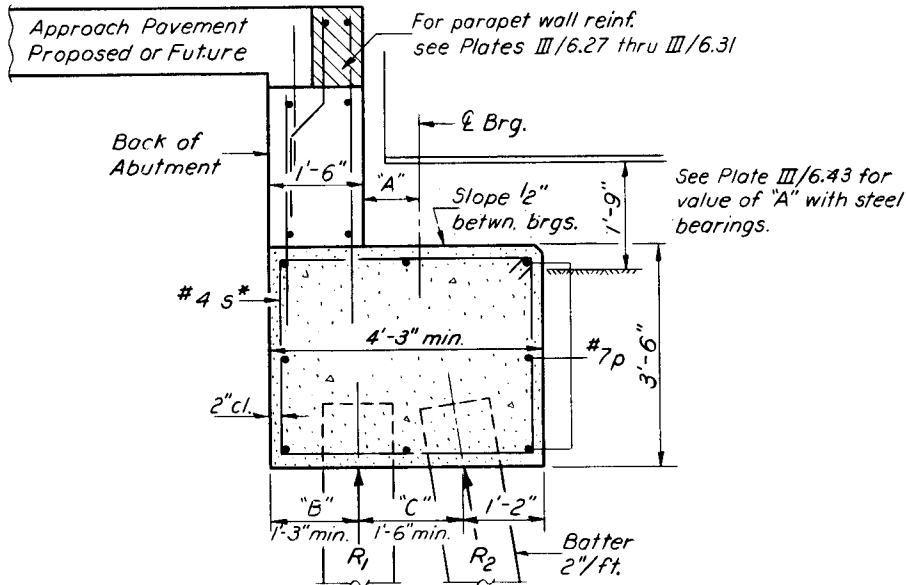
Pile bent abutment, typical details. (Source: State of Illinois)
